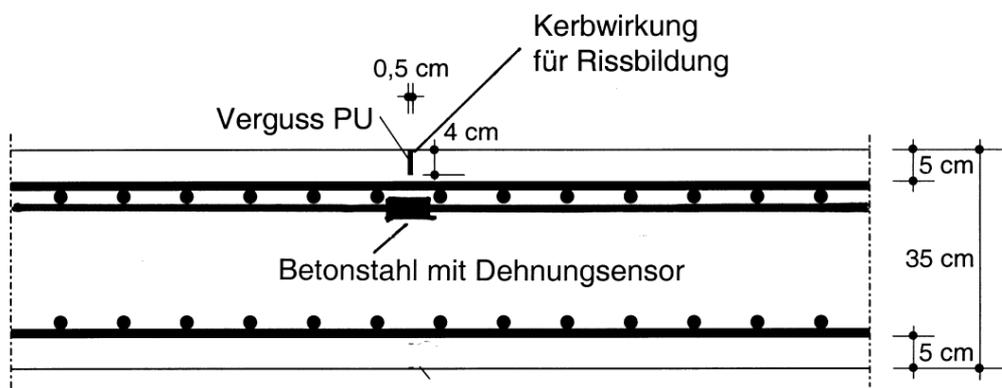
Breaking points within the reinforced concrete slab and arrangement of the strain gauges on the reinforcement bars
